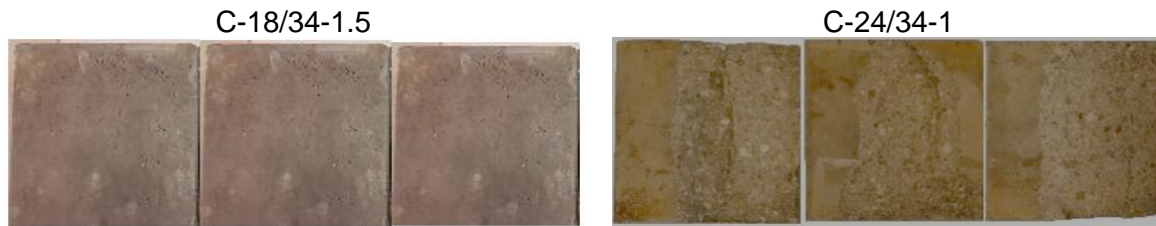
Spalled surfaces of prisms C-18/34-1.5 (no spalling) and C-24/34-1.
